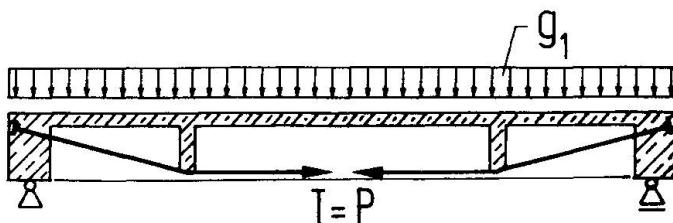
Statically determinate structure during prestressing, loaded with P and g_1
